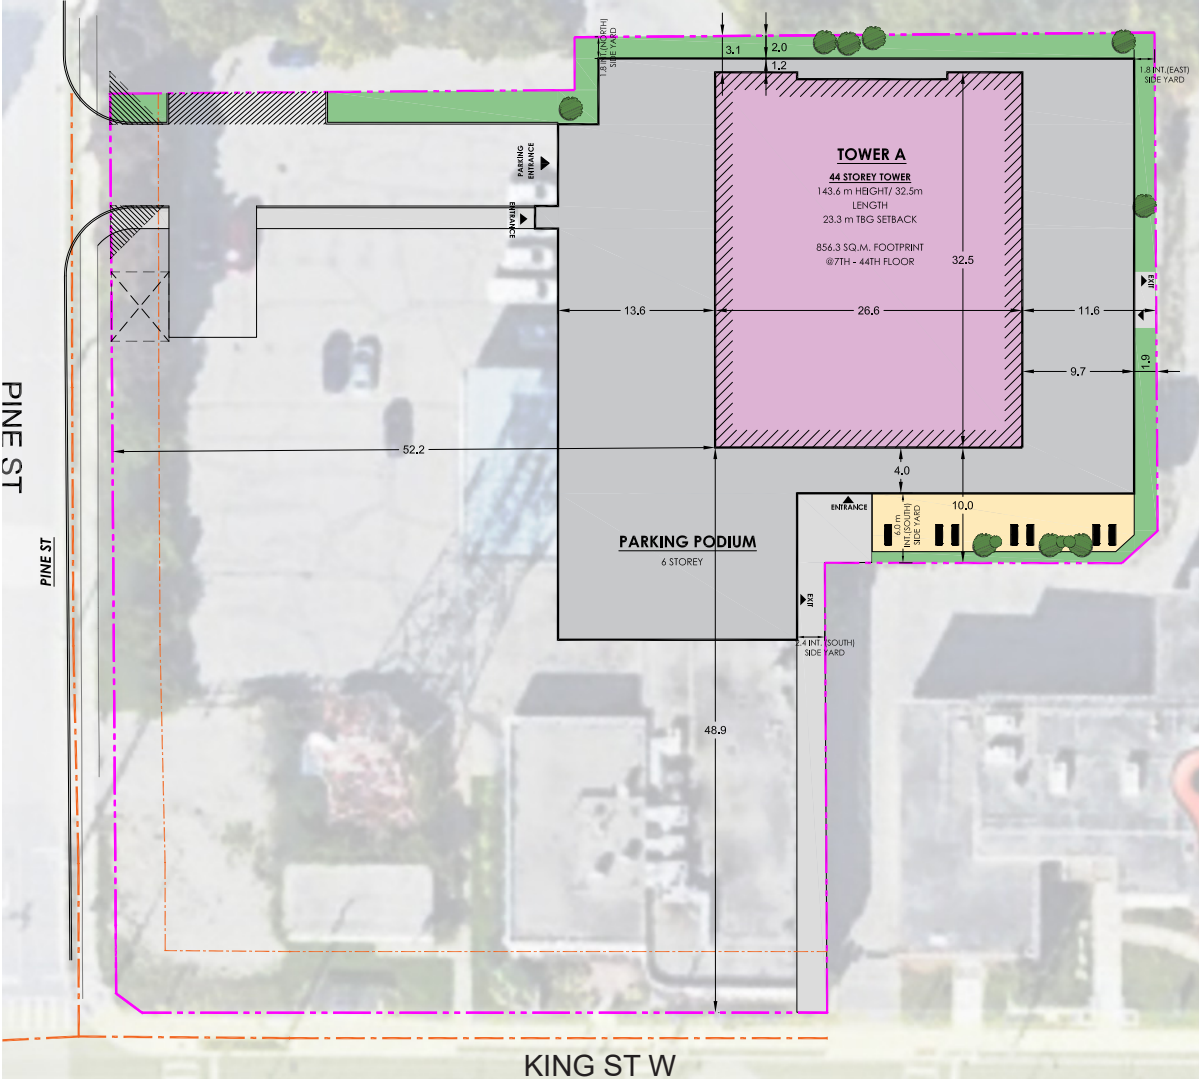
Proposed Site Plan (Reinders + Law, June 14, 2024)
